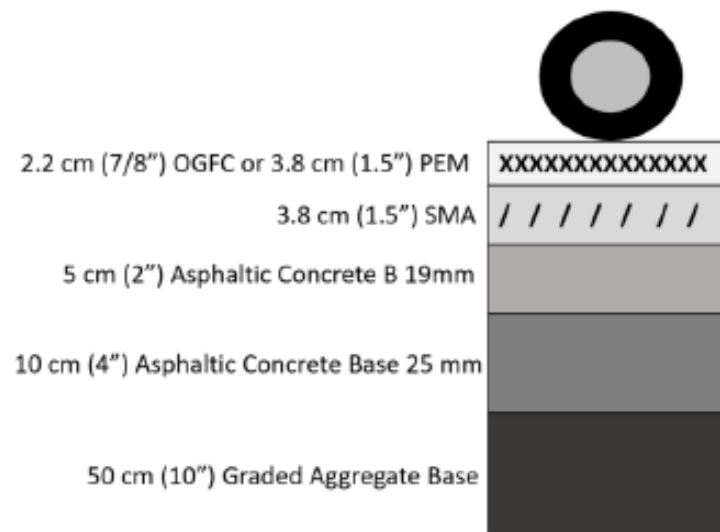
Layers Removed by Micro-Milling ("X" marking) vs Layers Removed by Conventional Milling ("/" markings)
